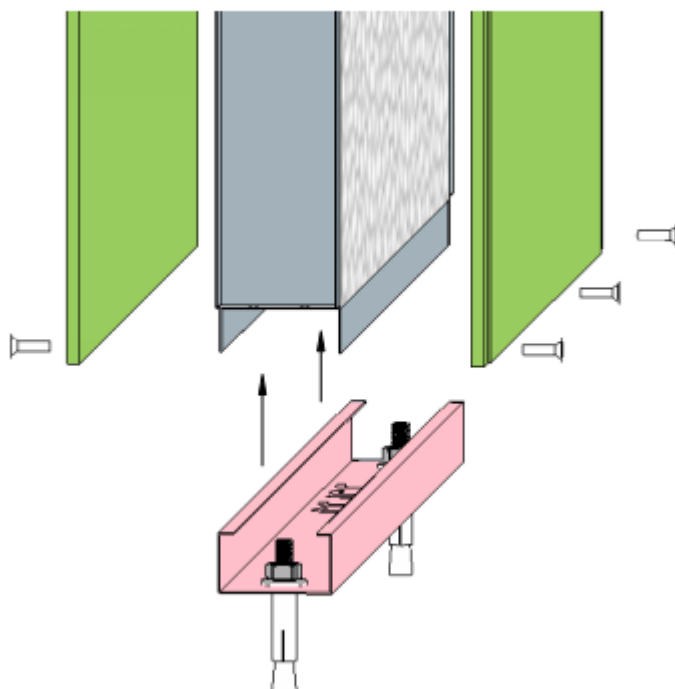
Typical Elevation of Intended Use – Framed Sub-floor
